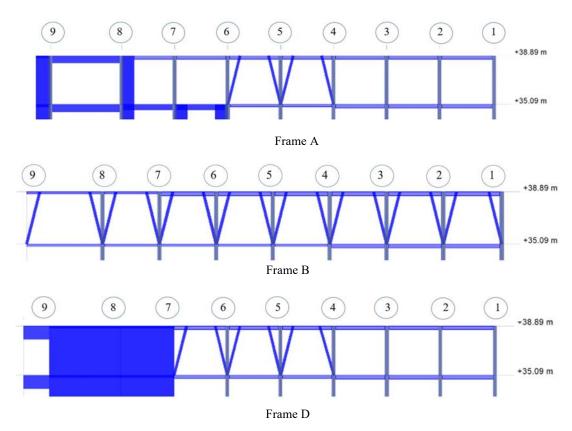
Strengthening the structure for improving progressive collapse resistance by means of eccentrical brace frames on longitudinal frames
